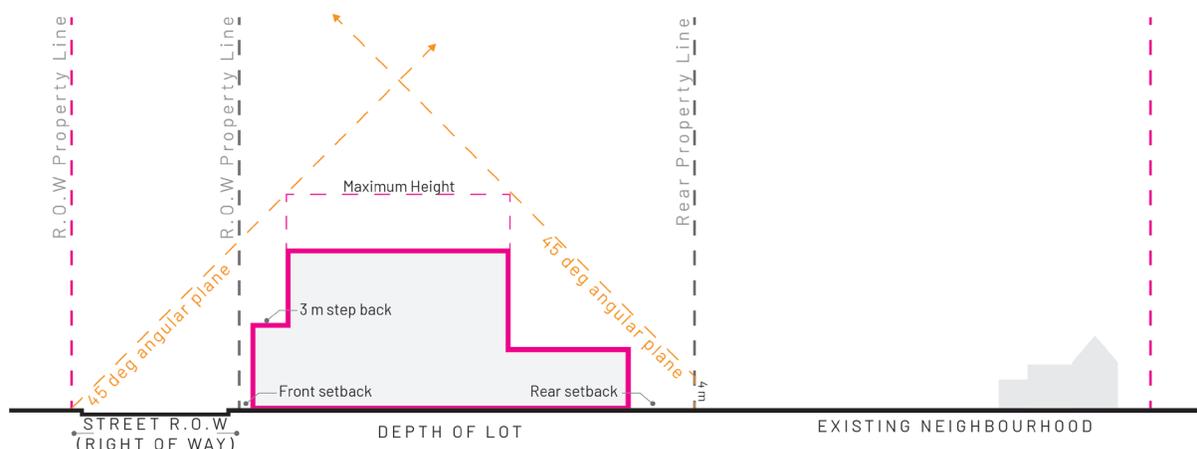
Sensitive transition between street and existing residential neighbourhood through angular plane
